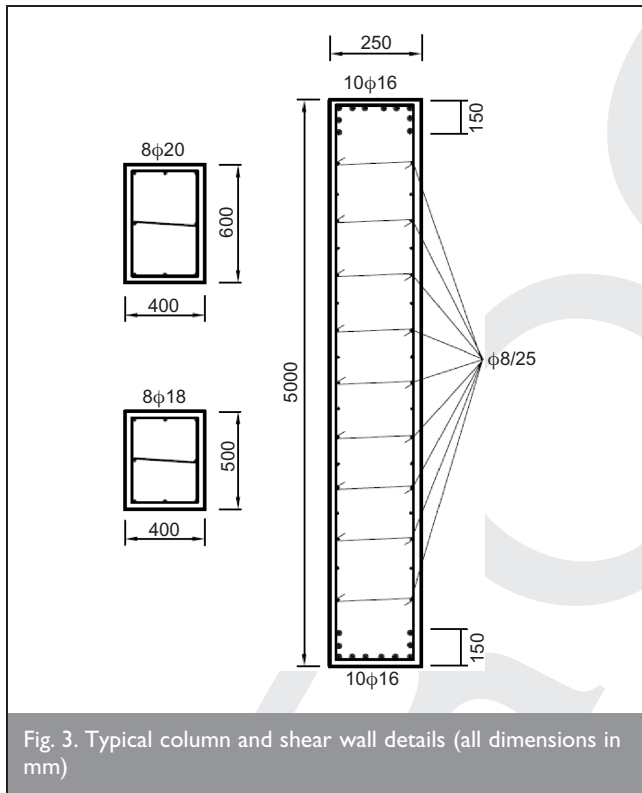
Typical column and shear wall details (all dimensions in mm)
